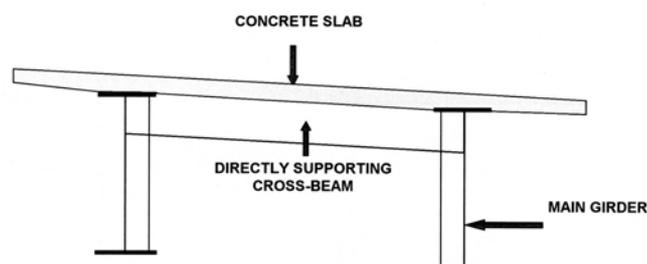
Twin girder directly supporting cross-beam bridge without cantilevers (pavement unidirectional banking)
